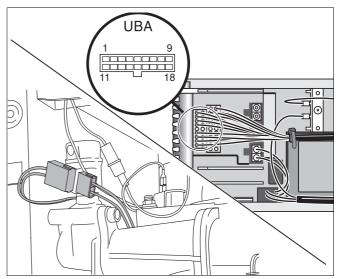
Buderus 600 - 11R / 19R / 24R: checking the safety sensor connection lead
